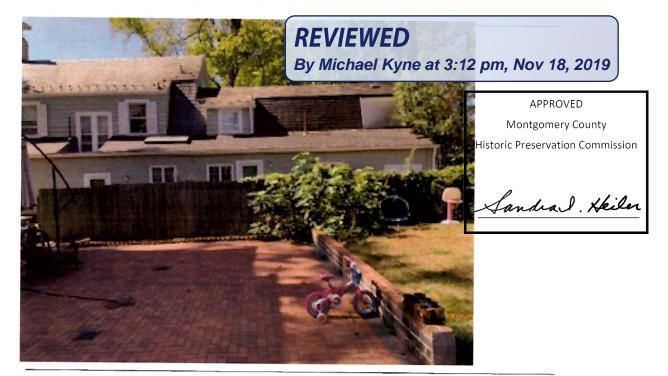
Existing Fence - Western view looking at 37 W Irving
